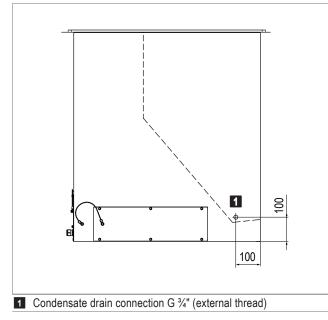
Dimensional drawing for condensate drain connection (in mm)
